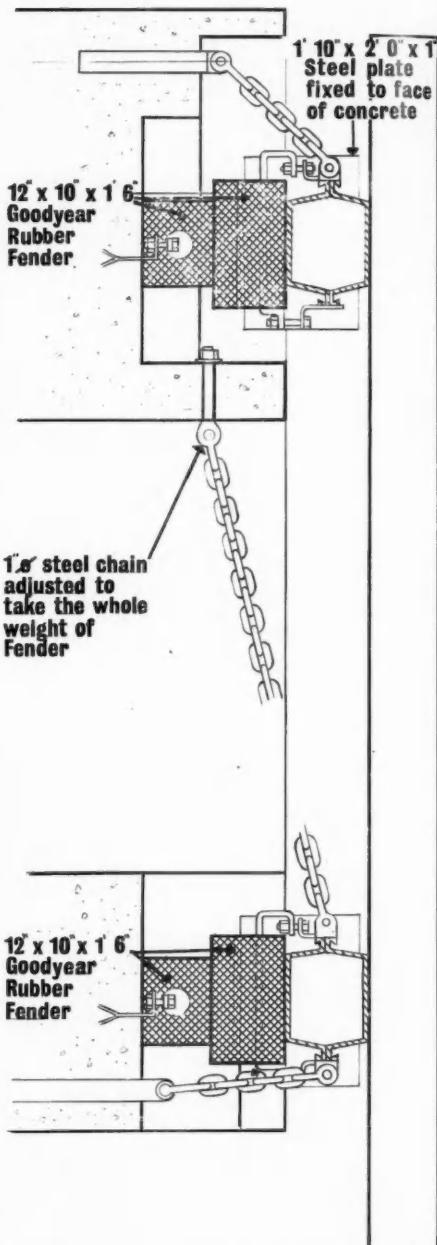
Sectional elevation of fender installation at Penang Ferry Terminal.
